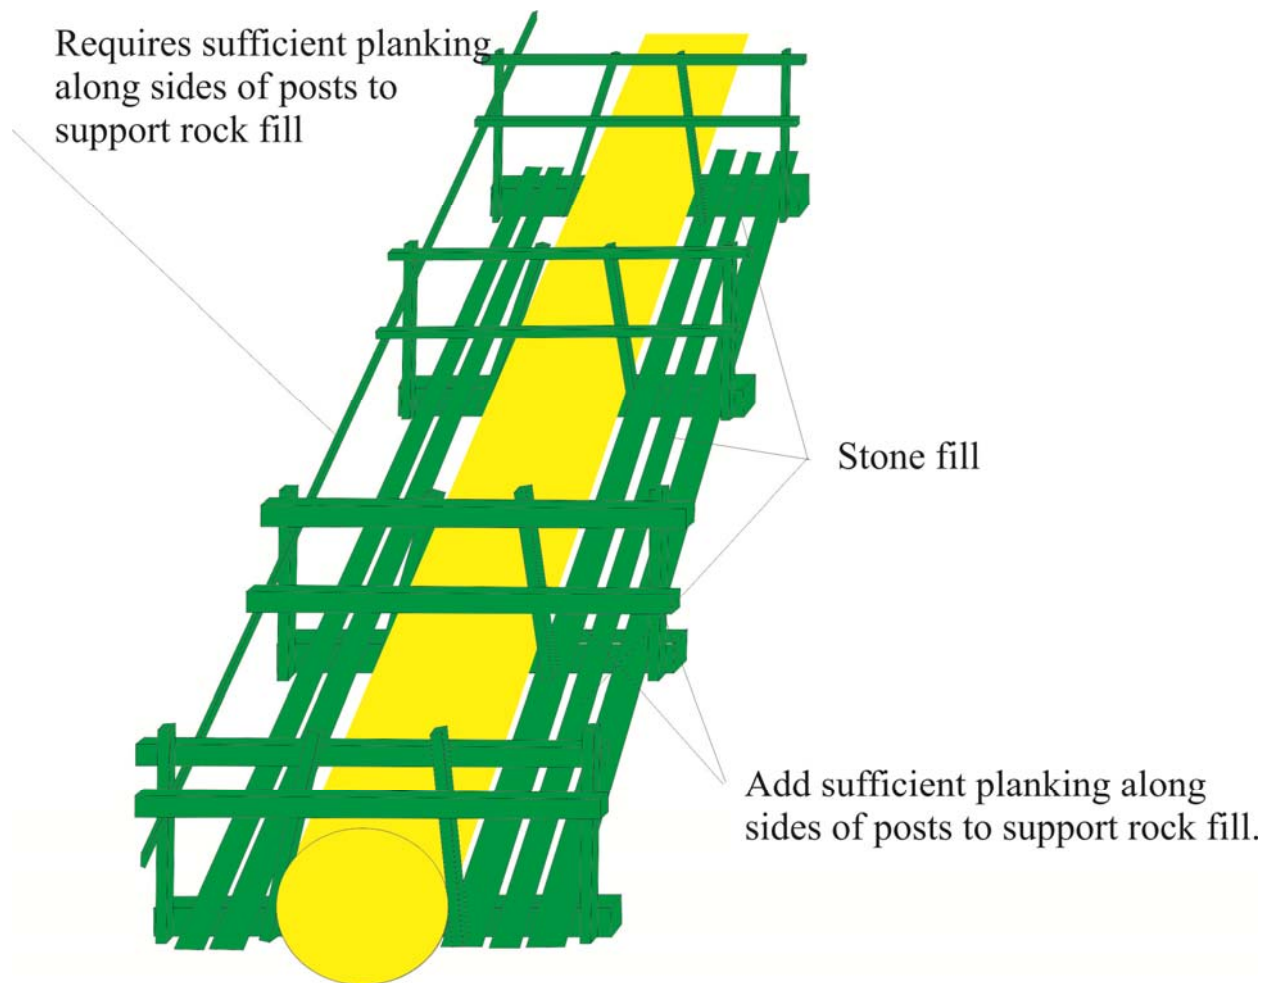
Illustration of a stone-filled crib anchoring the culvert in the intertidal zone on the beach.
